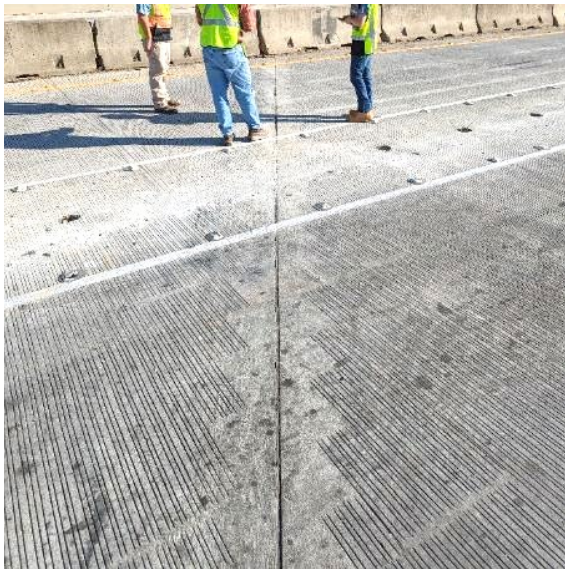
(d): Closed joint at Bent 2 (Construction Stage I)
